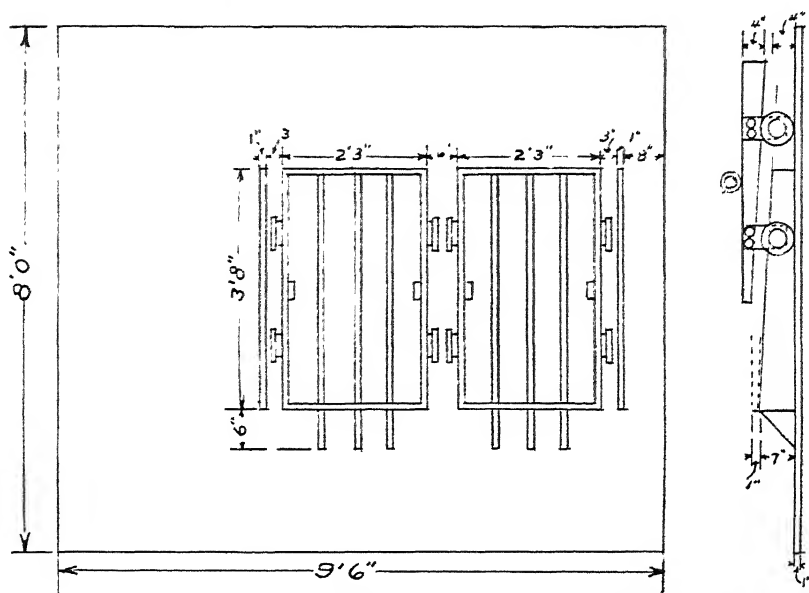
TOP VIEW OF INCINERATOR, SHOWING CONSTRUCTION OF TIGHT-FITTING DOORS.
